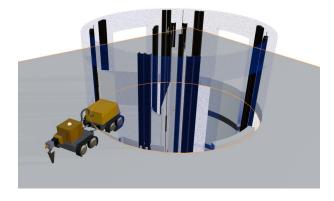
the position of exit and entrence [Wanxuhang, Blender] Fig 2-4-2 elevator at exit and entrance[Wanxuhang,Blender] Fig 2-4-3 exit above the ground[Chenjunrui, Sketch Up]
